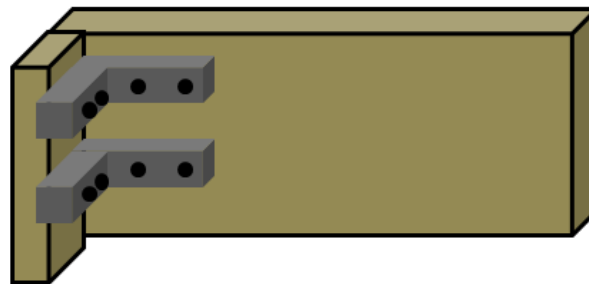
Wood joints held together by two, inner, 90 degree brackets
